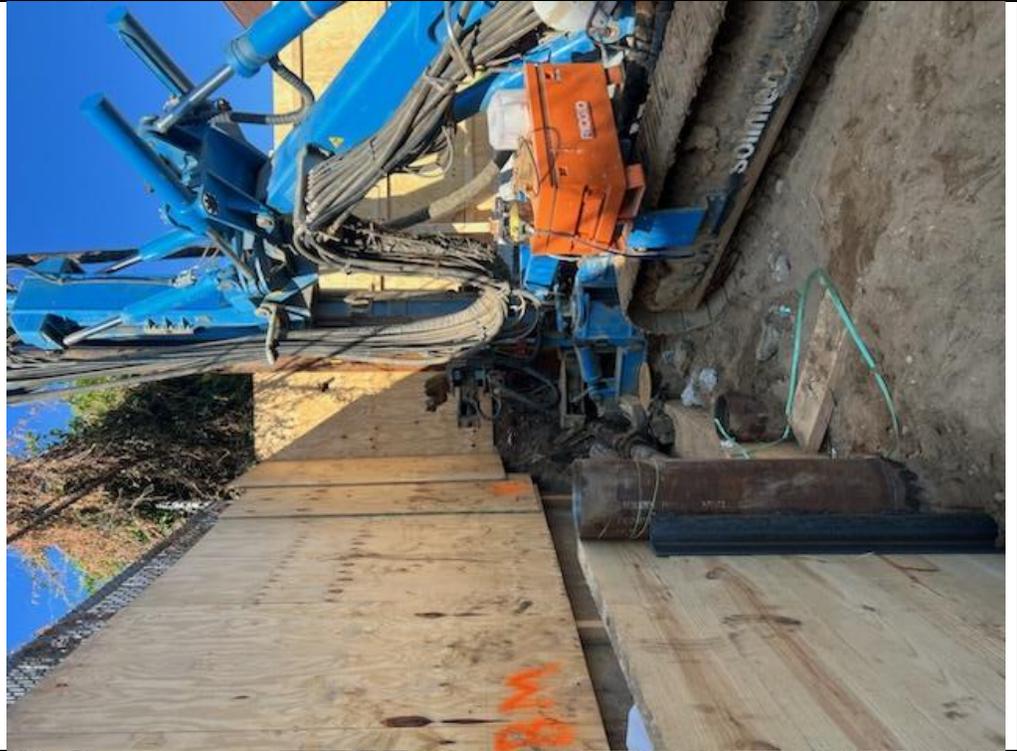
Installation of lagging support on the southeastern portion of the property.
